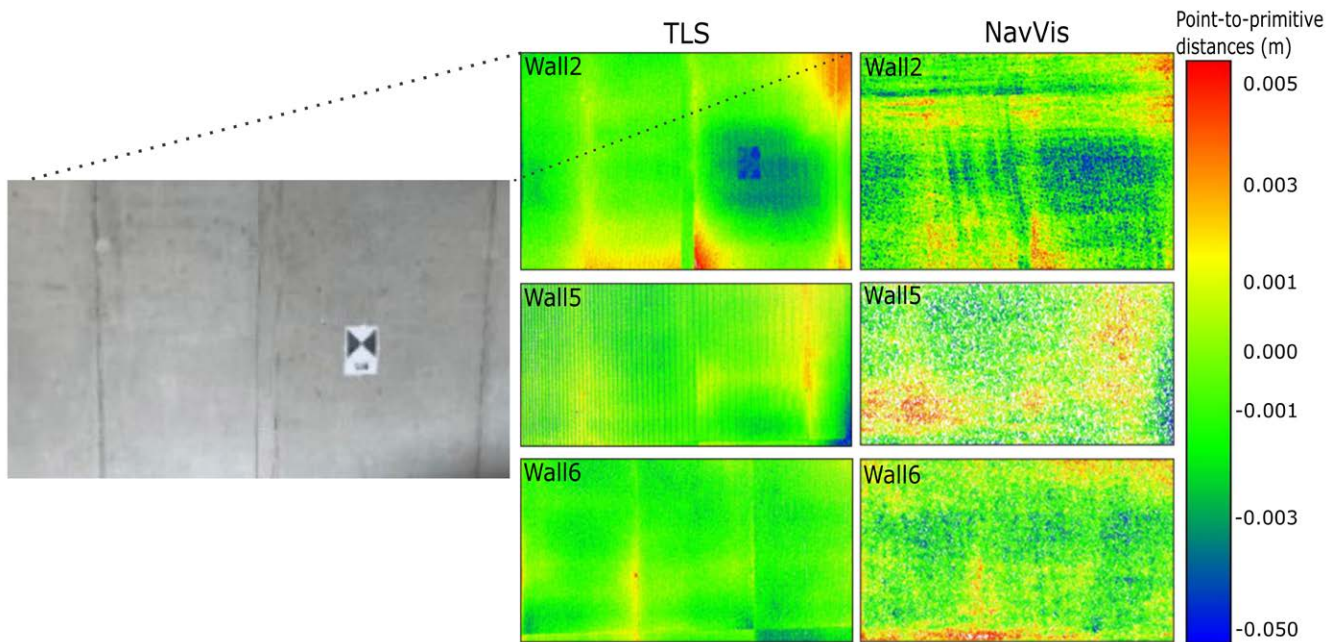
Noise measurements on Walls 2, 5, and 6. On the left, a picture of Wall 2 is given to show an example of the cracks on the walls, which are obvious on the images.
